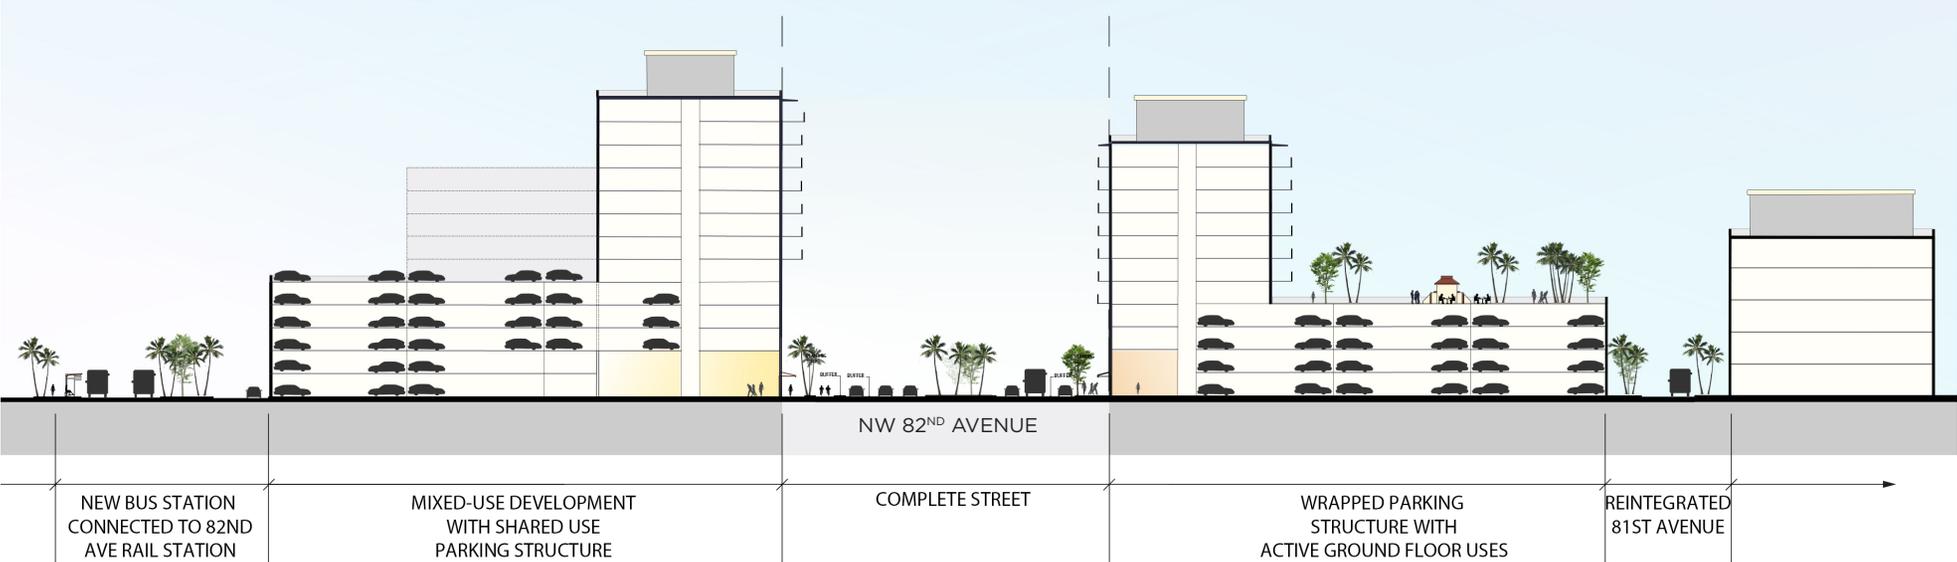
Cross-Section of the blocks flanking NW 82nd Avenue, looking South
